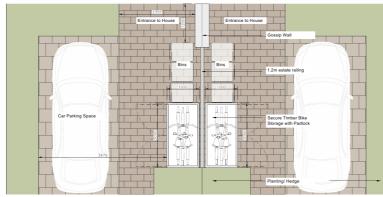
Typical curtilage plan with car parking (showing the location of bike storage unit).
